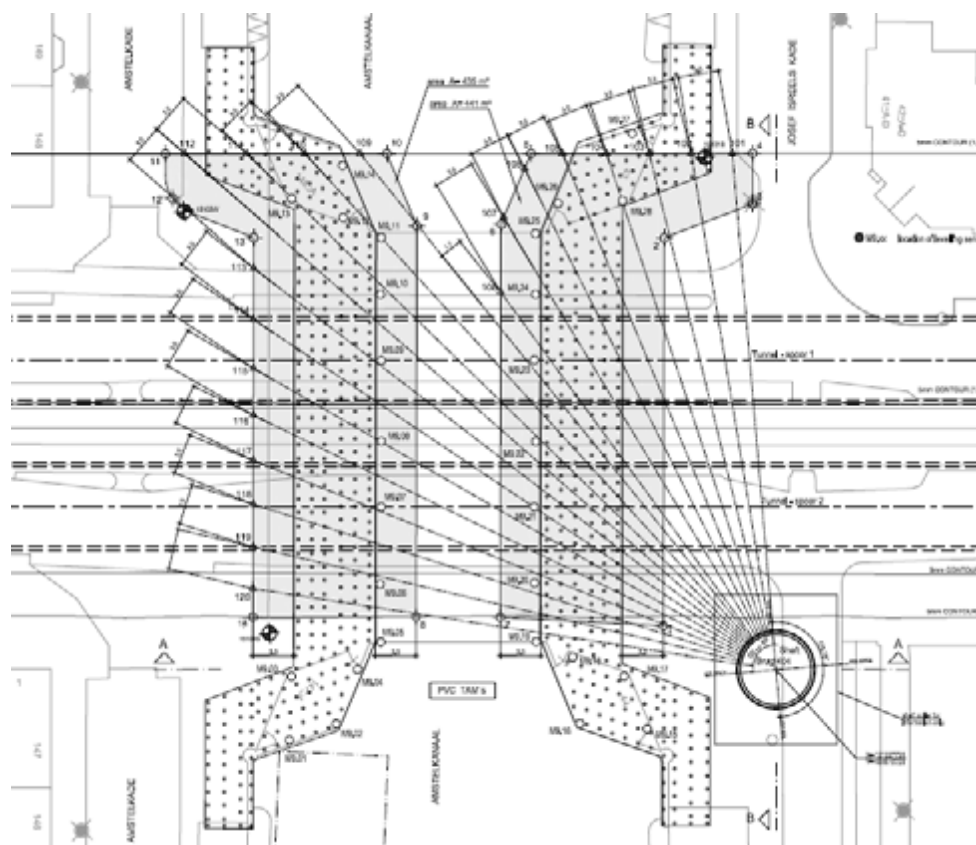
Layout of Compensation grouting pipes for the deep west tunnel
